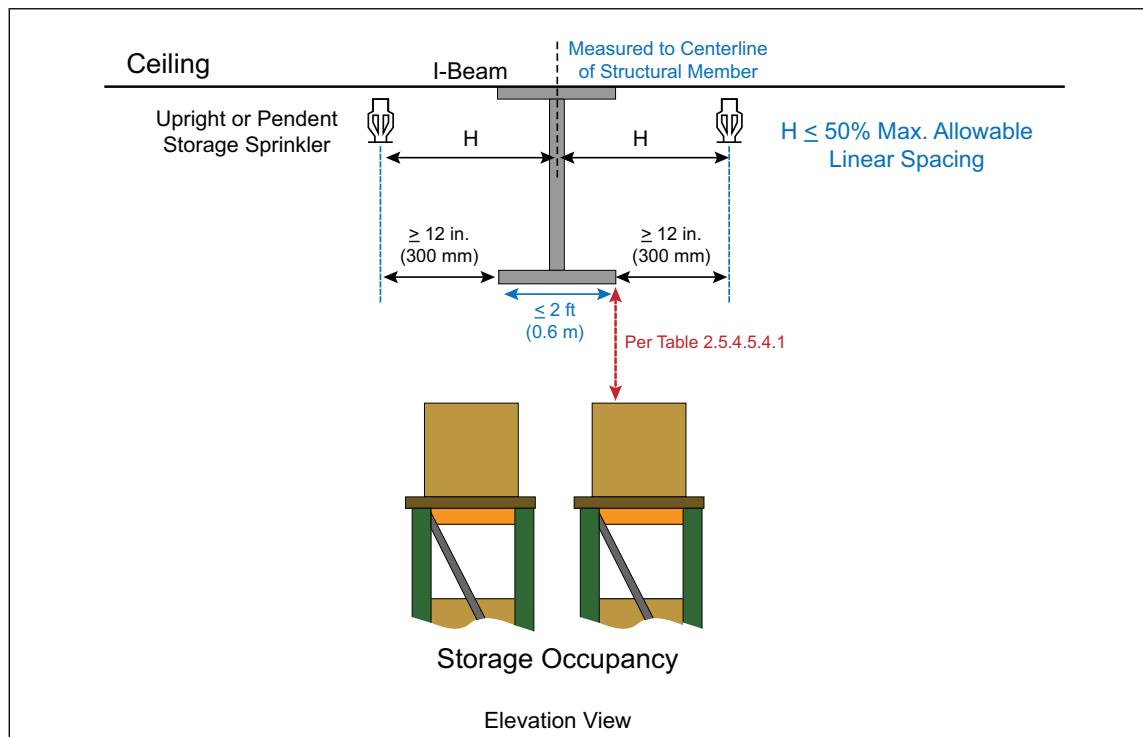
(b). Positioning ceiling-level sprinklers when ceiling structural members obstruct sprinkler discharge
